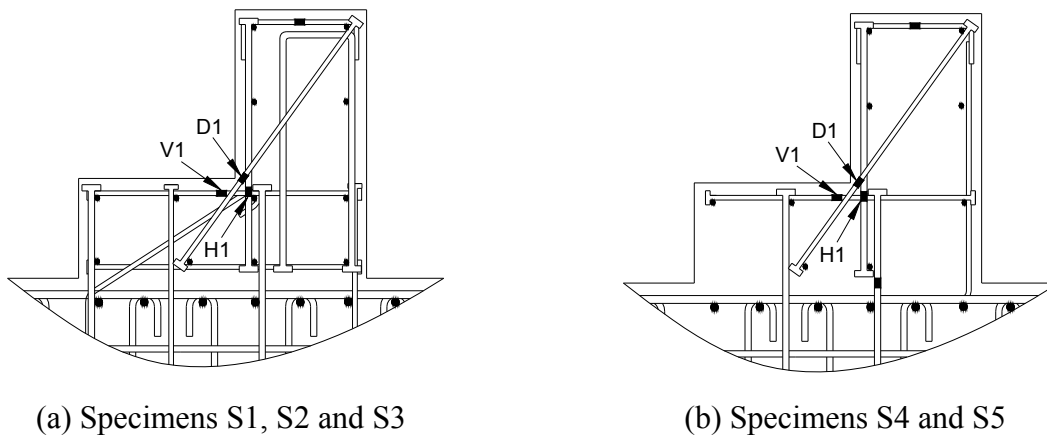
Reinforcement details of tested ISHs (in test orientation).
